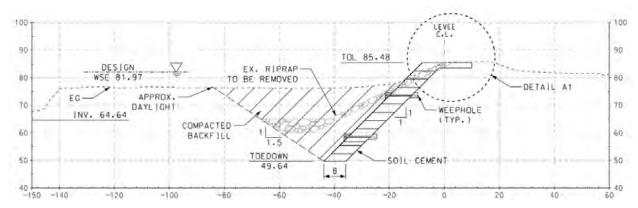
Typical Cross Section of Alternative 1, Soil Cement for Design Flow (Sta. 270+00)
